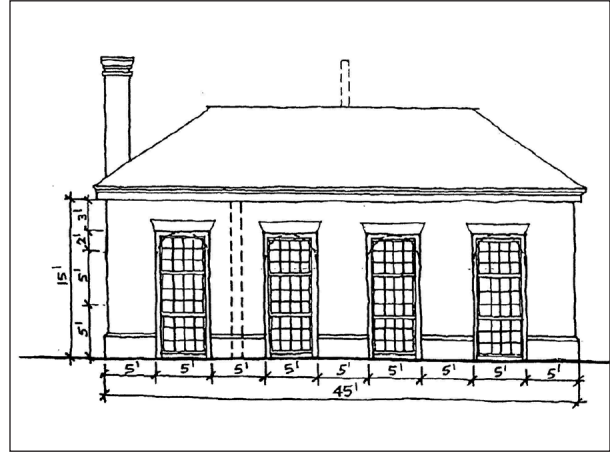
A conjectural sketch of the ca. 1740 greenhouse at the Green Spring Plantation in Virginia (Brinkley 2004:144), a conservatory style building similar in size to the second greenhouse at Gore Place.
